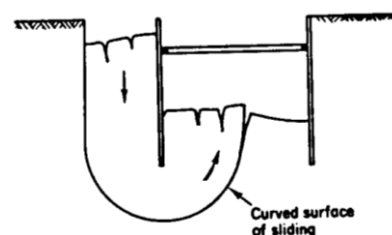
Failure of sheet piles due to deep sliding of excavated soft soils [16].
